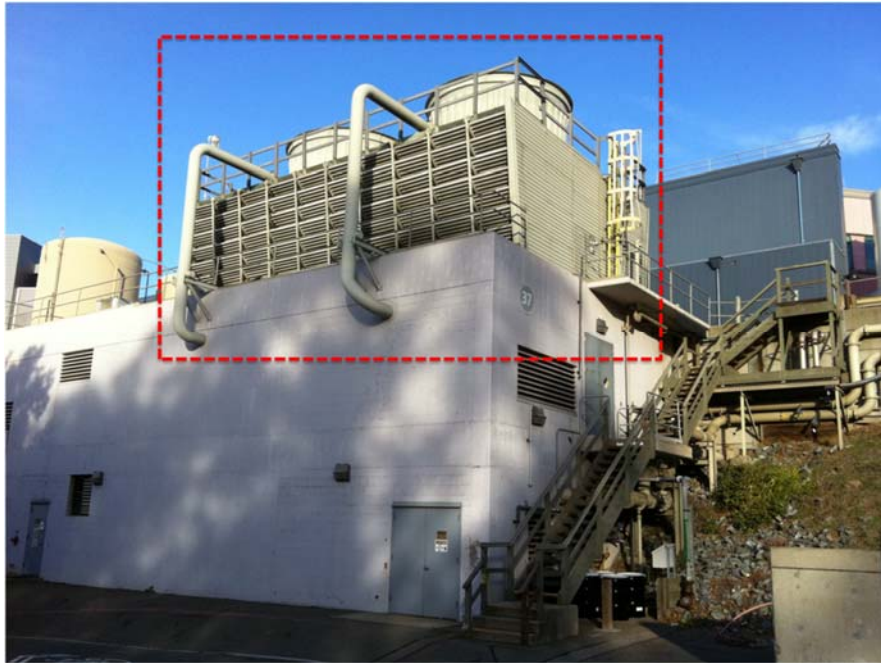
Existing Wooden Cooling Towers at LBNL (Taylor Engineering 2016)
